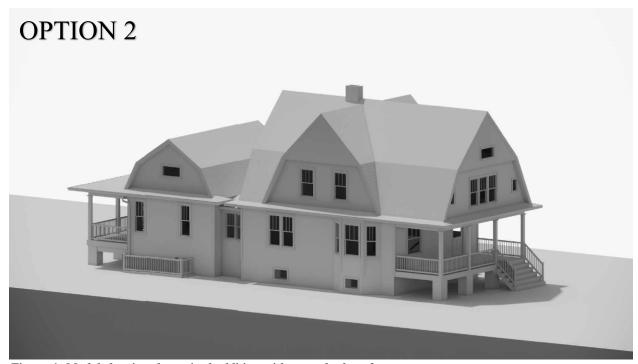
Model showing the revised addition with a gambrel roof. Source: Applicant.
